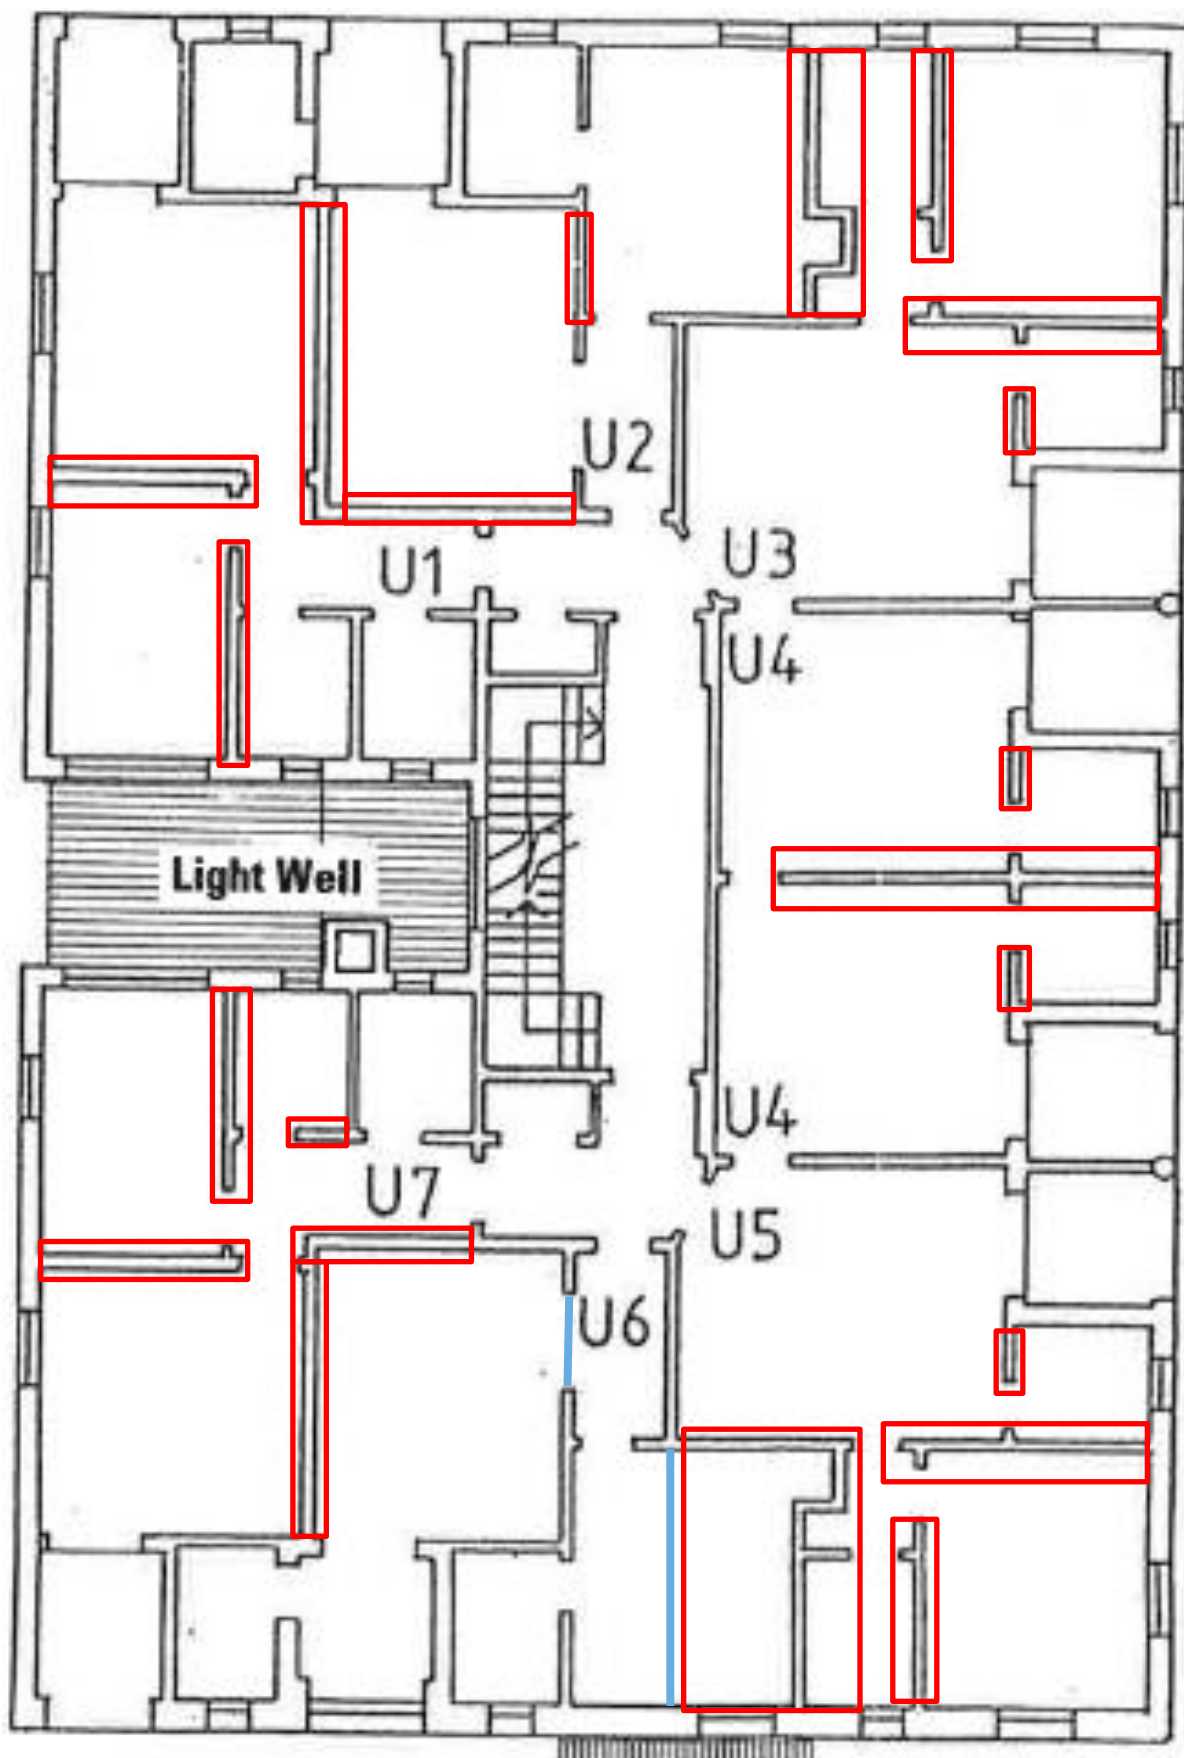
Level 2 plan of Wilkinson House in 2001, as compiled in the 2001 GML CMP. Demolished walls have been highlighted in red.
